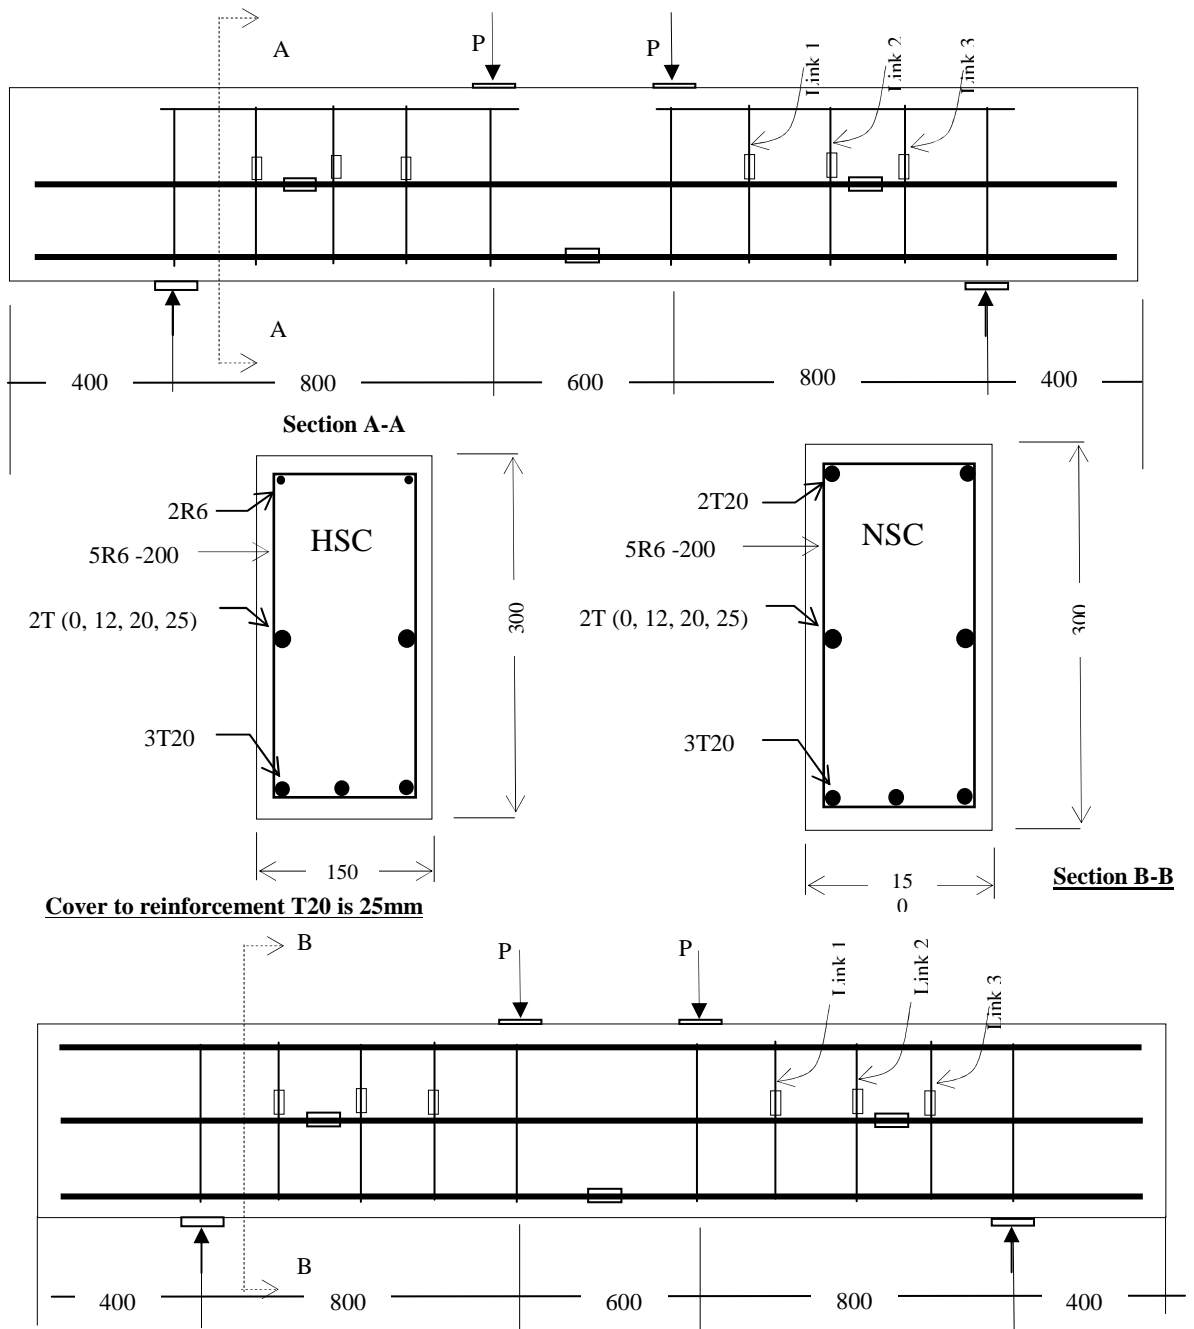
Reinforcement details and position of strain gauges for HSC and NSC test specimens.
